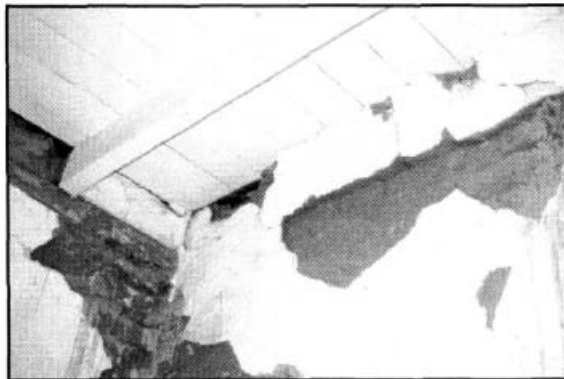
Damage to the interior wall on the south of Room 6. The wall suffered a slight offset at the top due to out-of-plane rocking of the wall.
